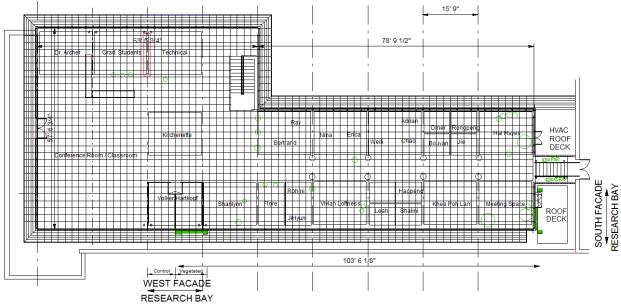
Intelligent Workplace floorplan showing west and south façade green wall research installations, Leininger, 2012
